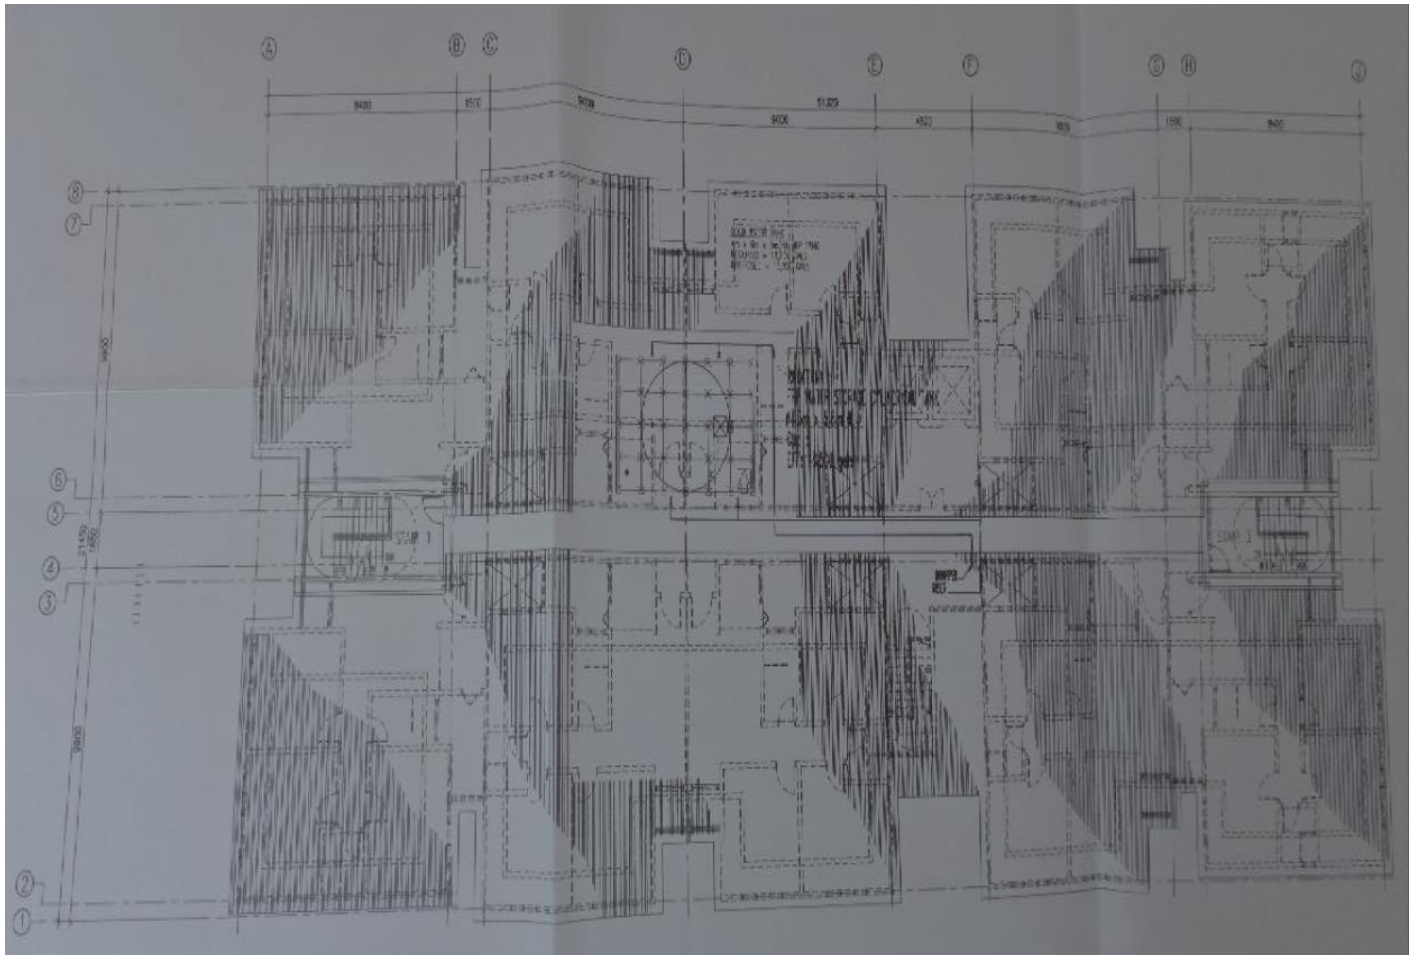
Roof floor plan of Block A3 Unicity building obtained from Unimap Holding
